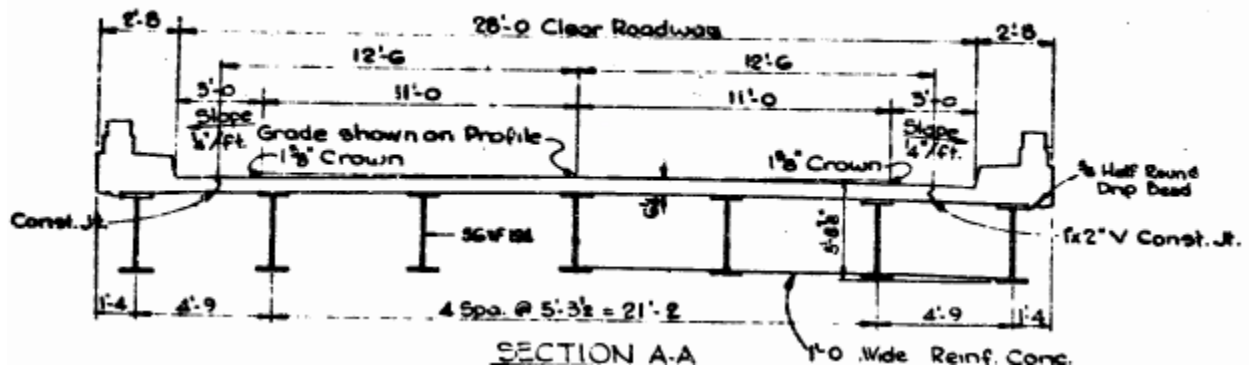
Typical Section of the Bridge (NBI 40300) (1960)
